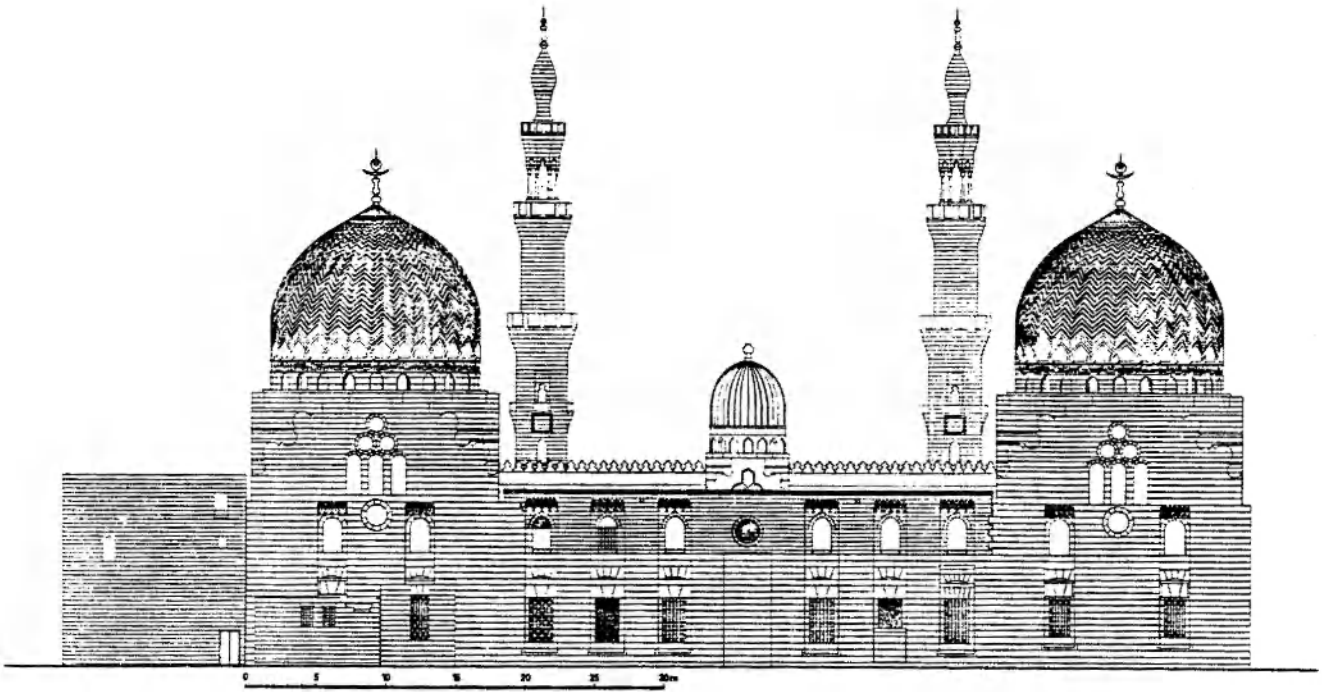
Bin Barquok Mosque - East Elevation - Cairo.
